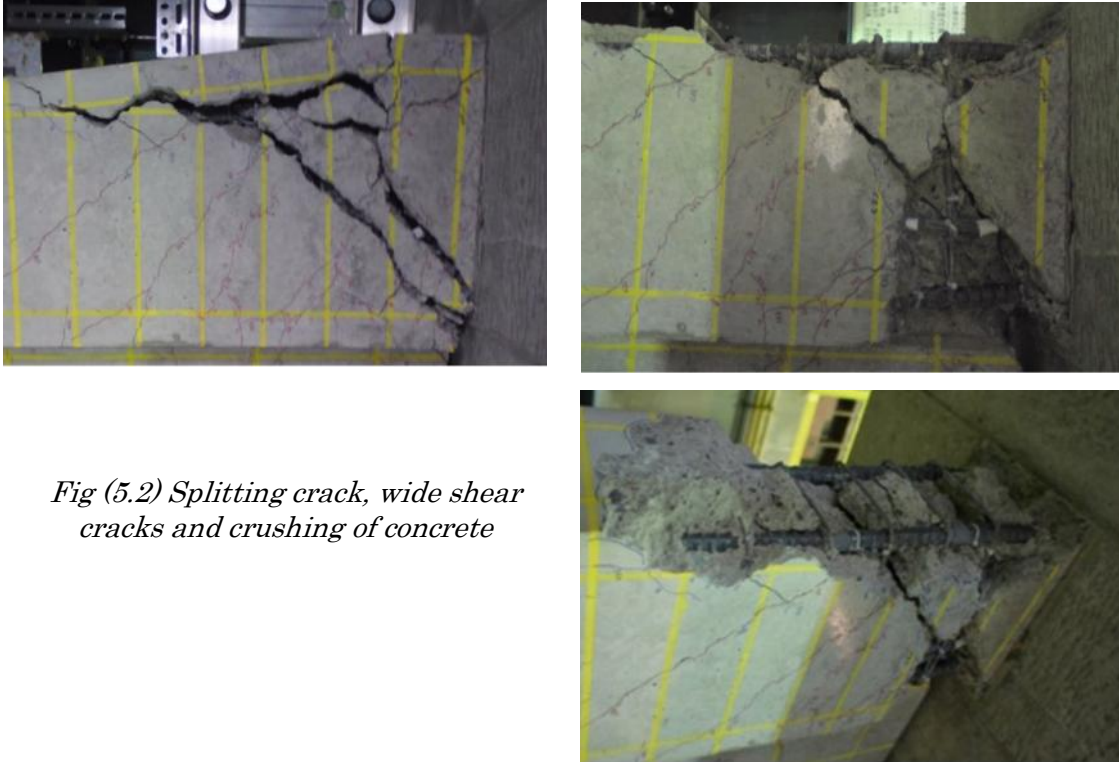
Splitting crack, wide shear cracks and crushing of concrete
